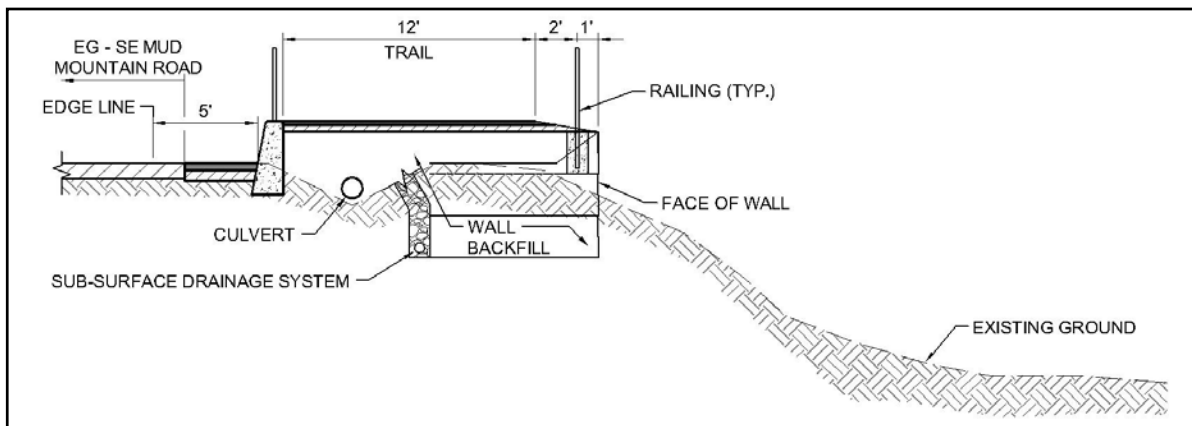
Section A Sub-Option - Trail with Culvert South of SE Mud Mountain Road
